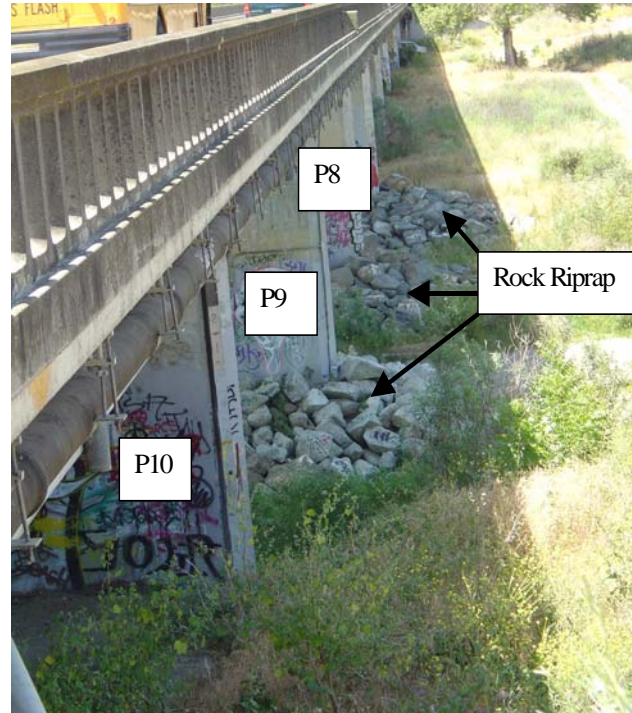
Rock riprap placed at Piers 7 through 10 of the San Juan Road Bridge.
